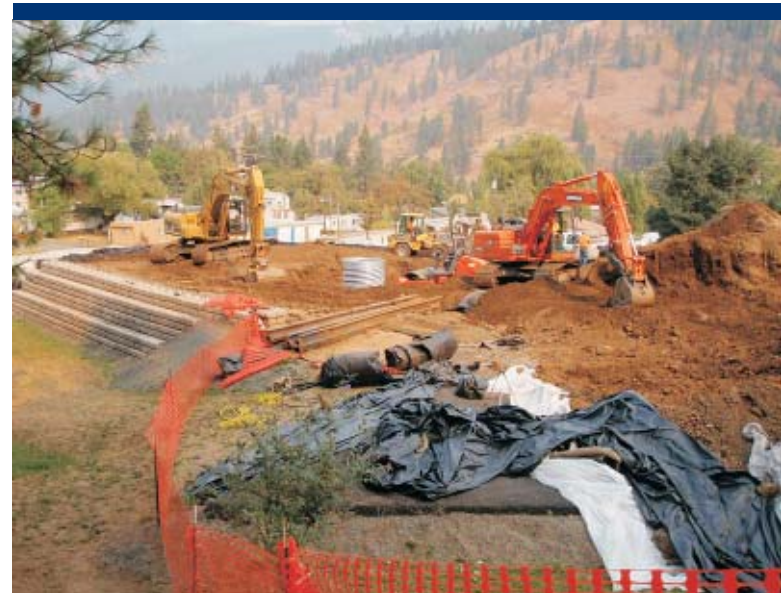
Placement and compaction of asbestos-contaminated soil around dry well.
